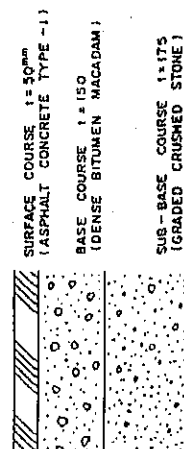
TYPICAL CROSS SECTION FOR 73.2 m
